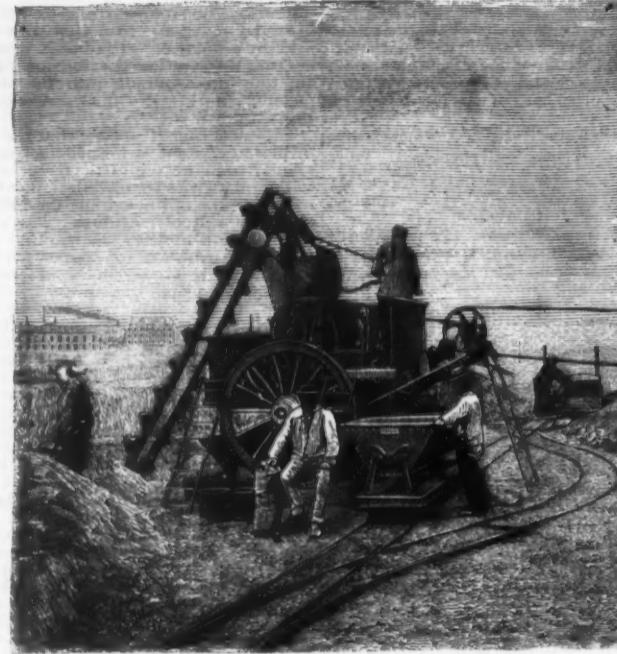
MACHINE FOR MANUFACTURING BETON AND MORTAR.
